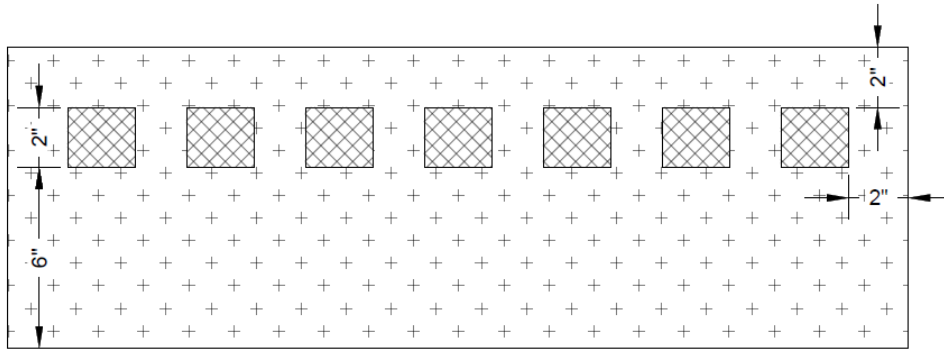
Cross-Section Diagram of FRC Test Slab
